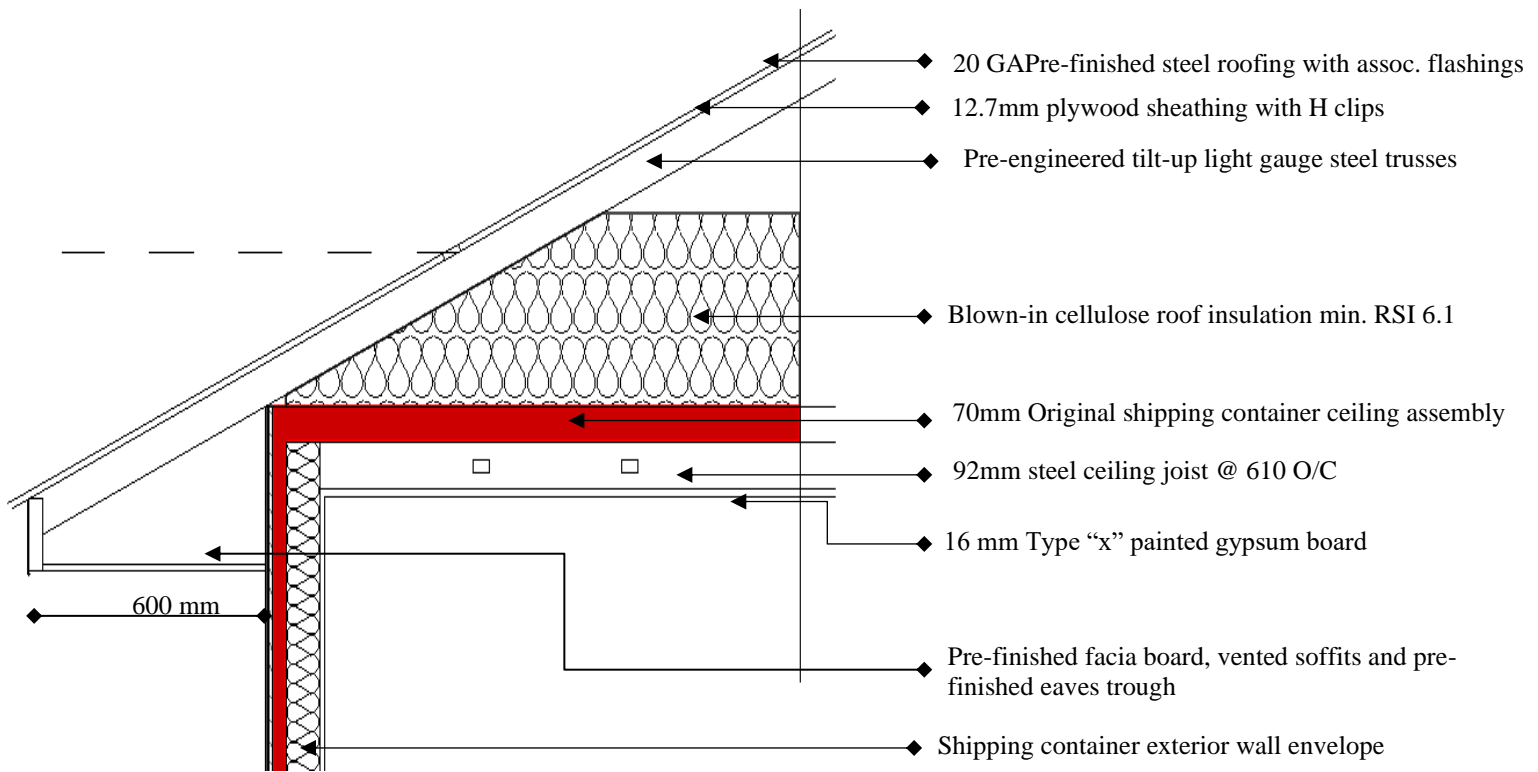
D-05 Container Envelope to Building Roof Connection Detailing
